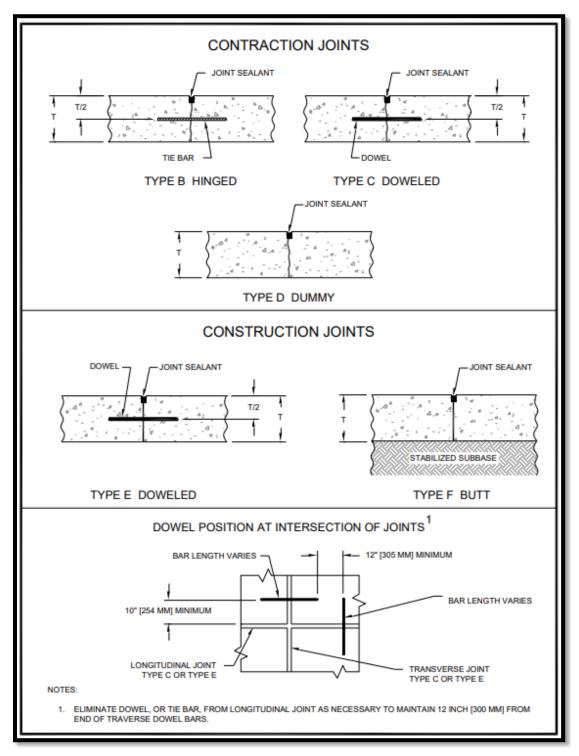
Rigid Pavement Contraction and Construction Joints.
